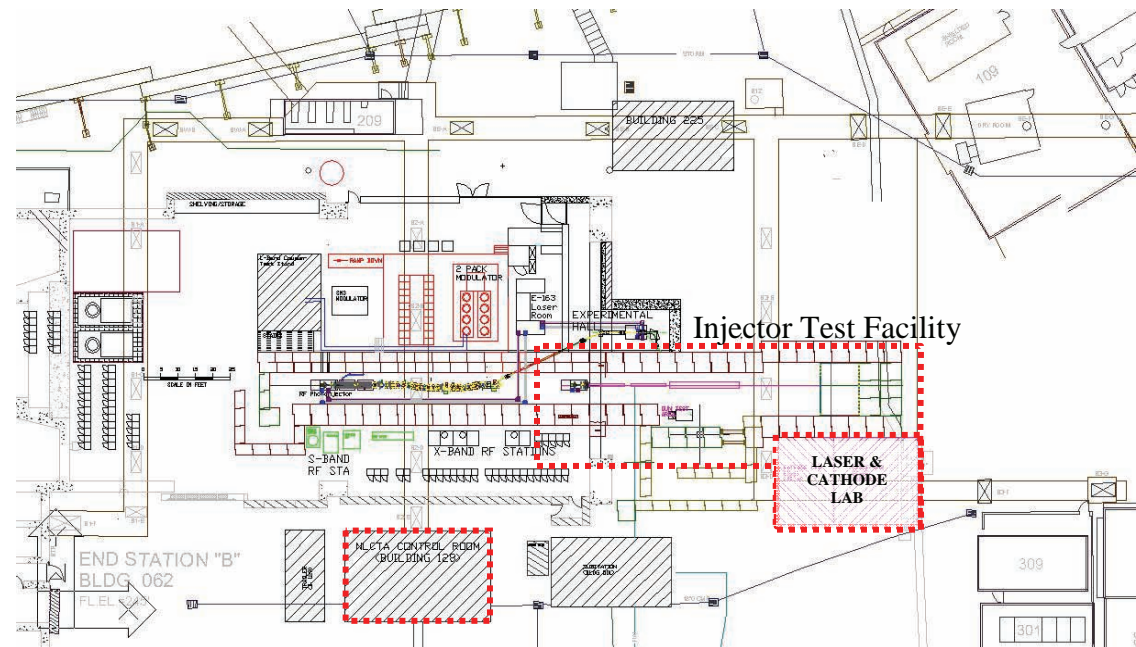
Possible siting of the ITF in End Station B, option 2. The Laser room and cathode preparation lab are housed in a separate, new building outside the End Station. The machine shop is new construction; all other facilities are existing or require minor refurbishing.
